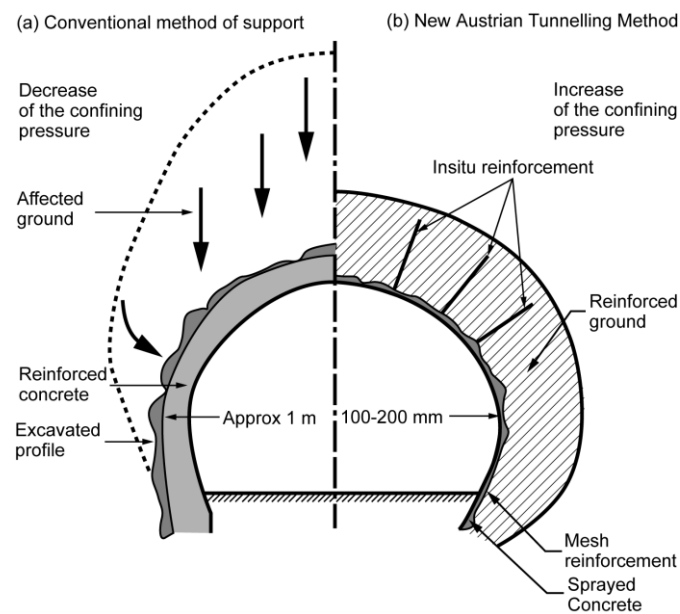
Schematic comparison of the New Austrian Tunnelling Method and a traditional method of supporting an underground gallery (from Bruce and Jewell, 1986)
